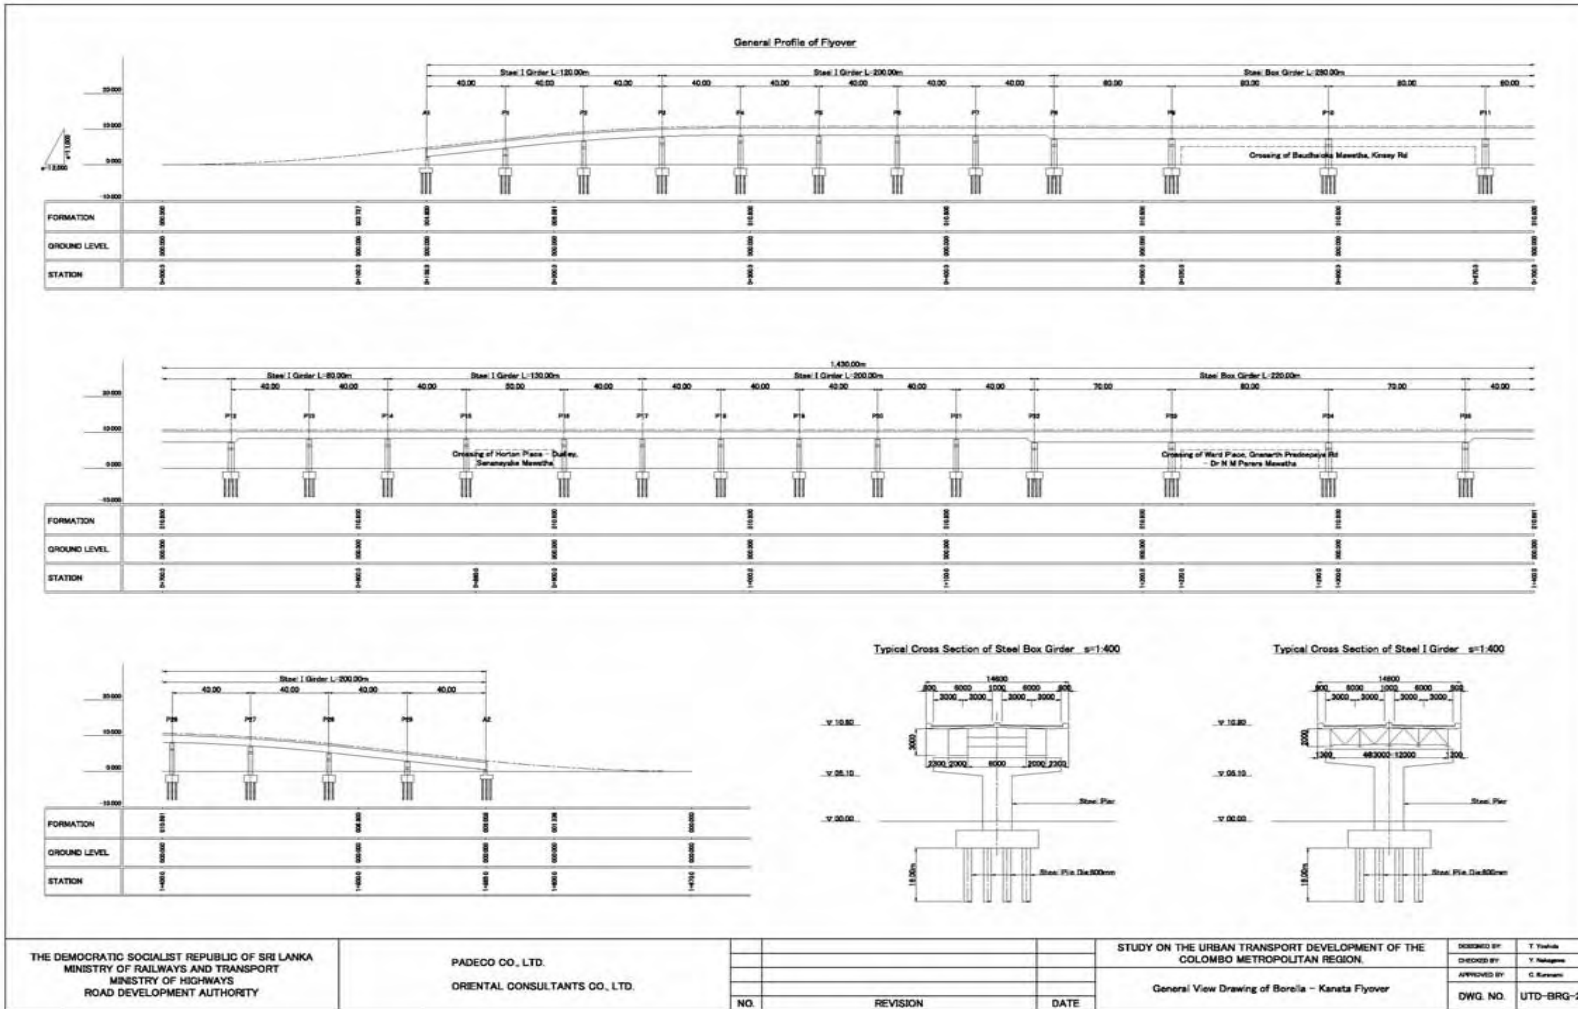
General View Drawing of Borella - Kanata Flyover
